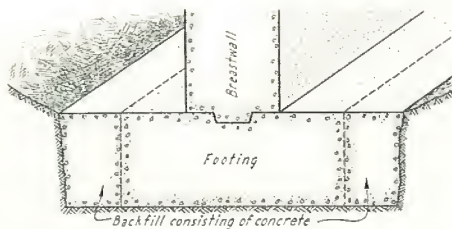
Horizontal movement of the footing is checked when the concrete fills the full width of the footing trench.
